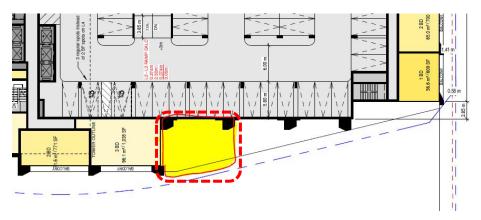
Consider an additional residential use bay to line the above grade structured parking on the West Elevation
